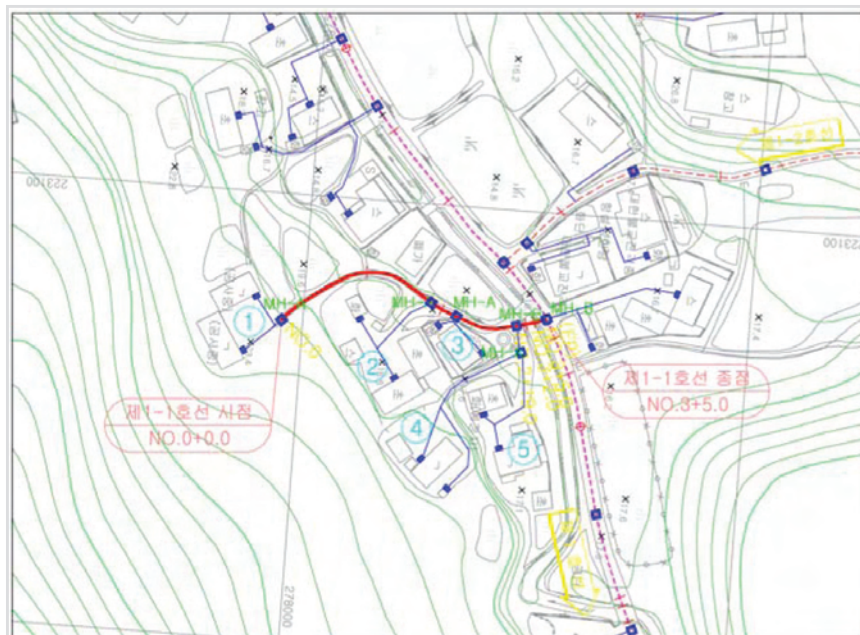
Construction Plan for Yangdong Village Sewage Pipeline
